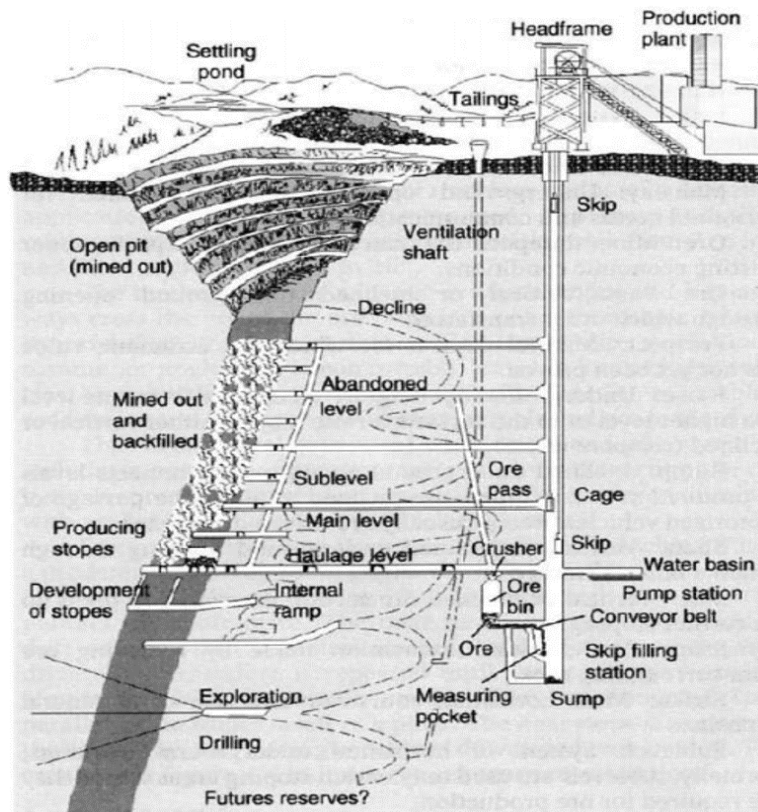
Underground mine infrastructure - Ground level concrete plant scenario (Hartman and Mutmanský, 2002).
